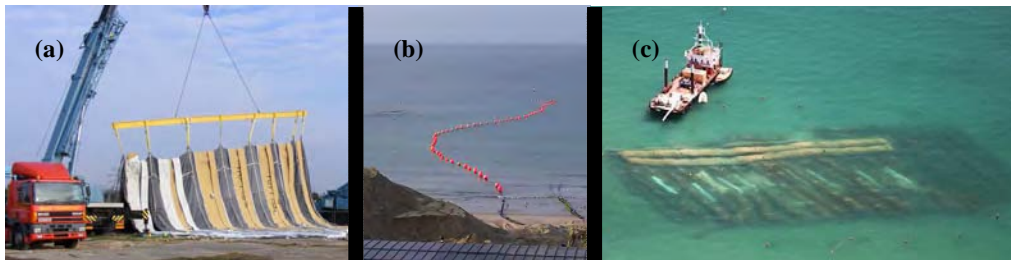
(a) Hoisting a section of unfilled geotextile containers on to the barge for deployment (b) the sand slurry pipeline (c) the completed lower layer with two of the top layer containers in place.
